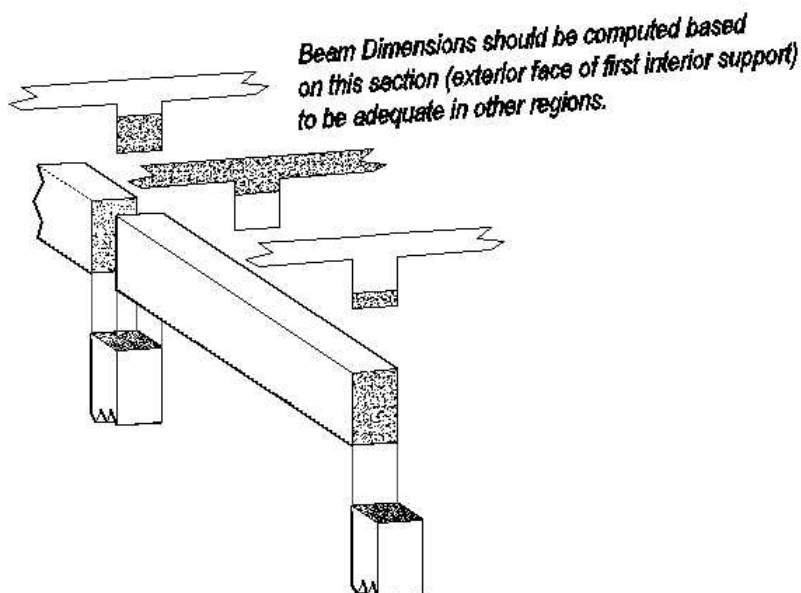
Sections behavior for beam "A" of Example 12.2-1.
